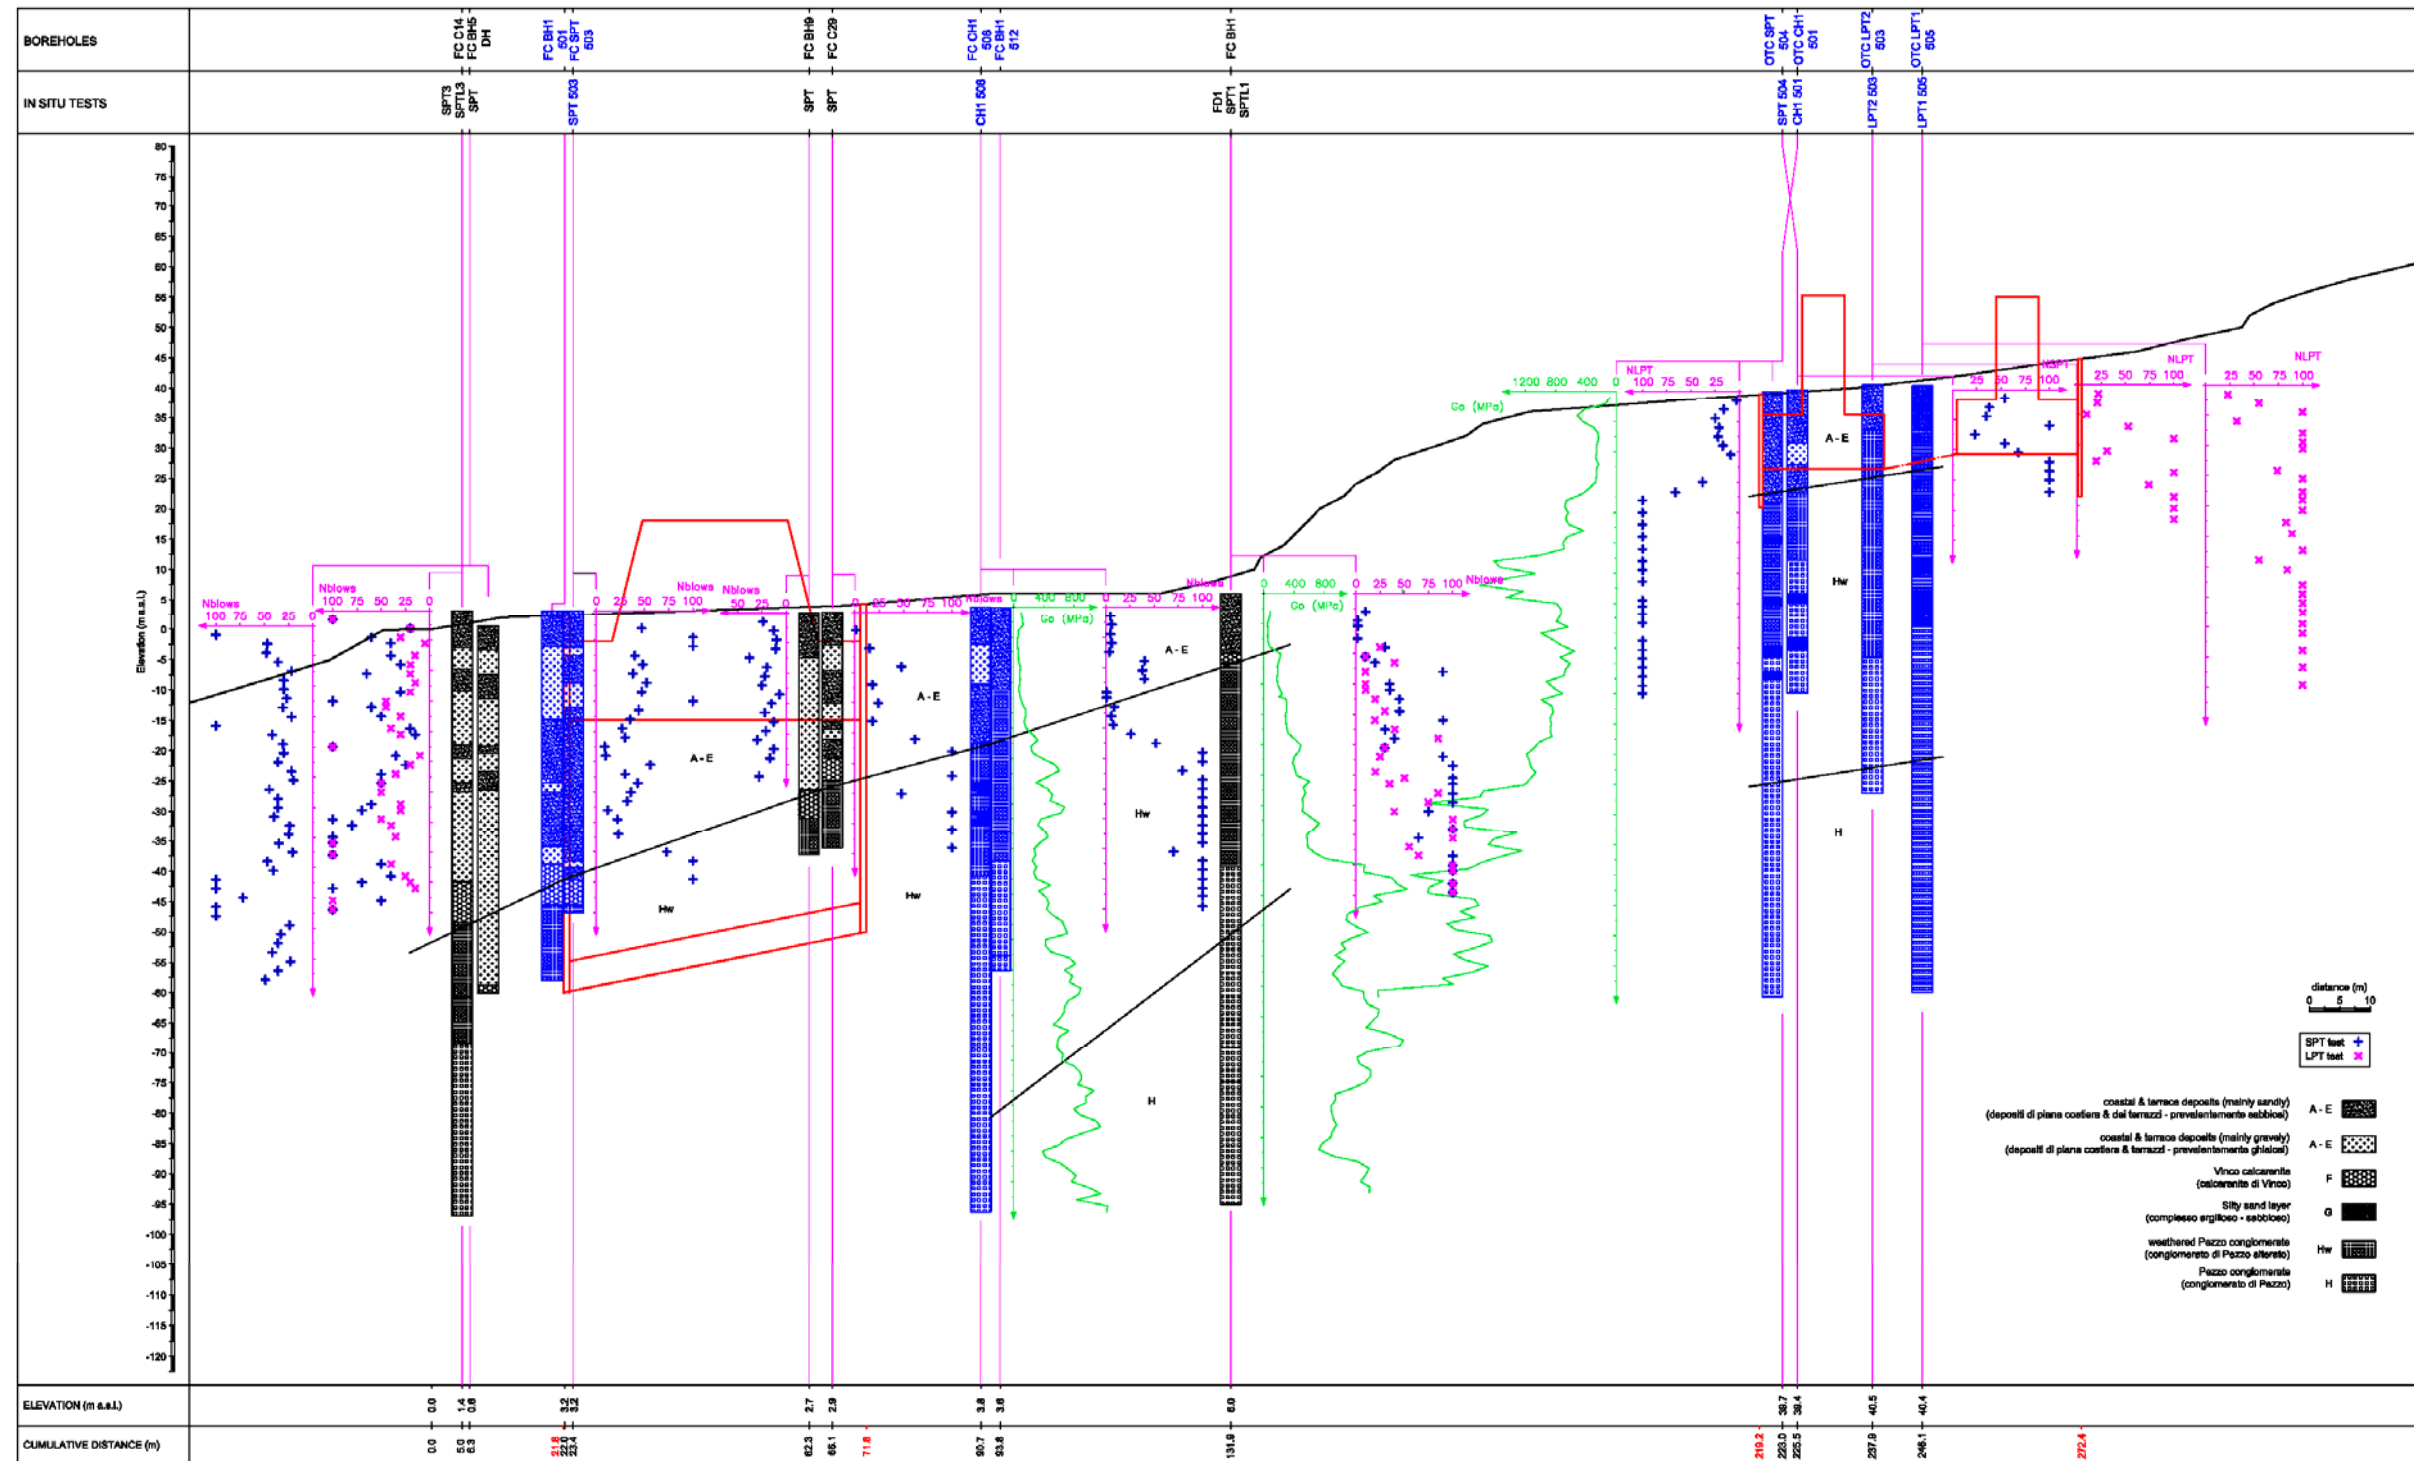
Calabria shore - geotechnical longitudinal section at the tower and the terminal structure
